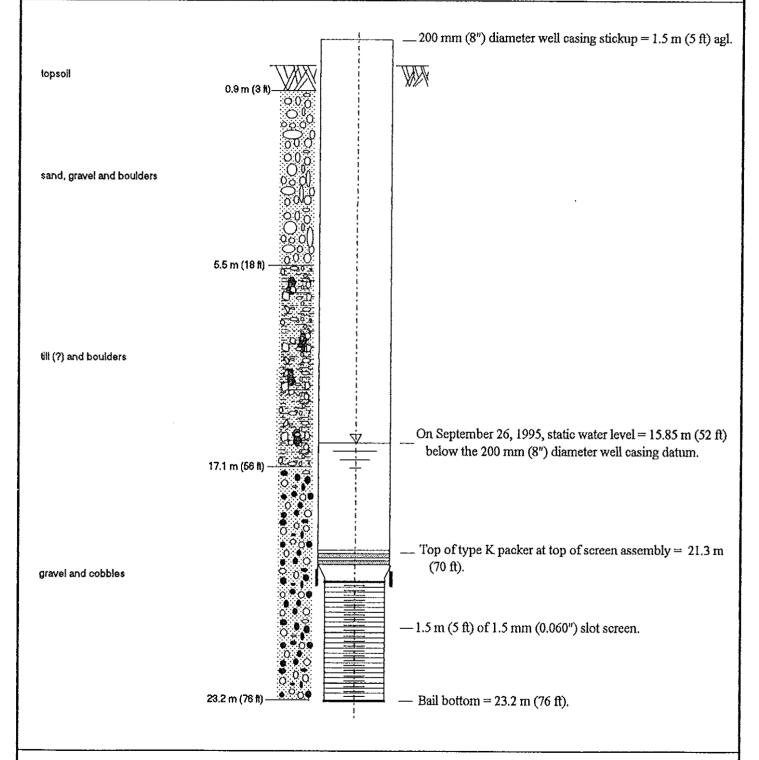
DETAILS ABOUT AREA DRILLED WELLS/TEST HOLES
